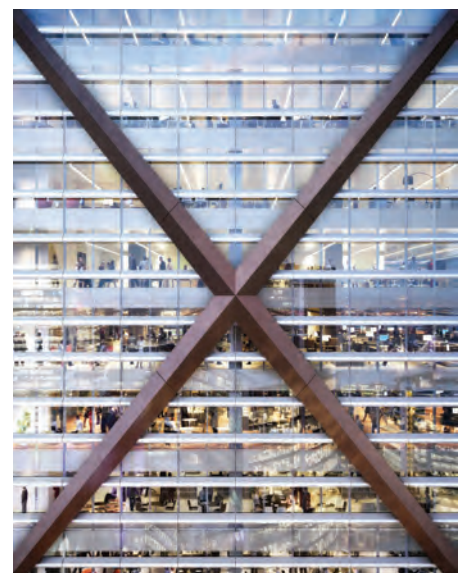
Façade study. (Source: Eric Parry Architects & DBOX)
